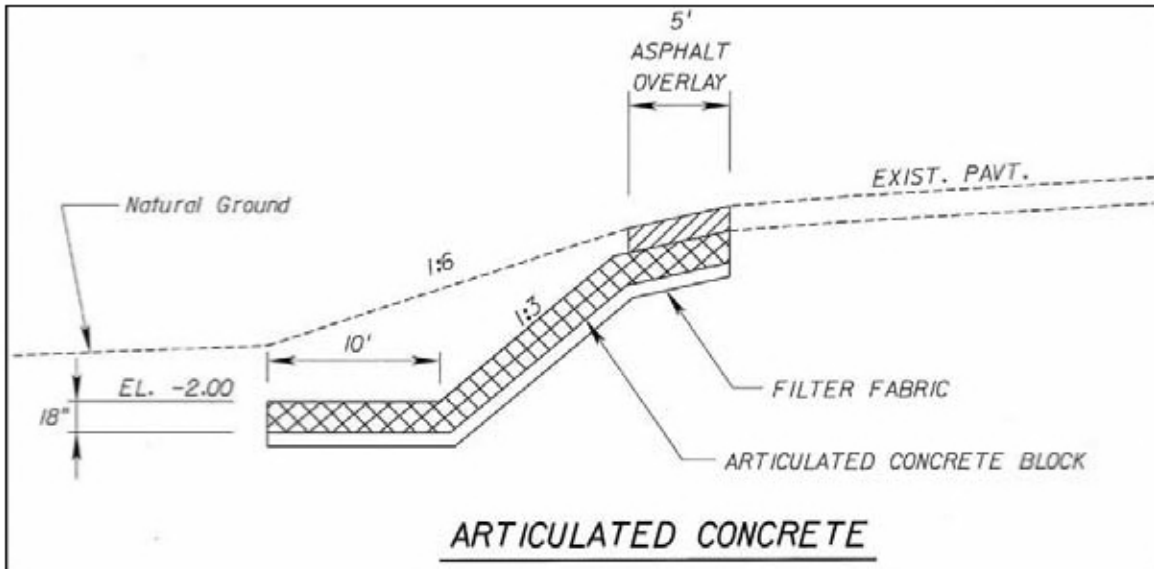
Conceptual design to resist pavement damage due to coastal storm surge overwash
